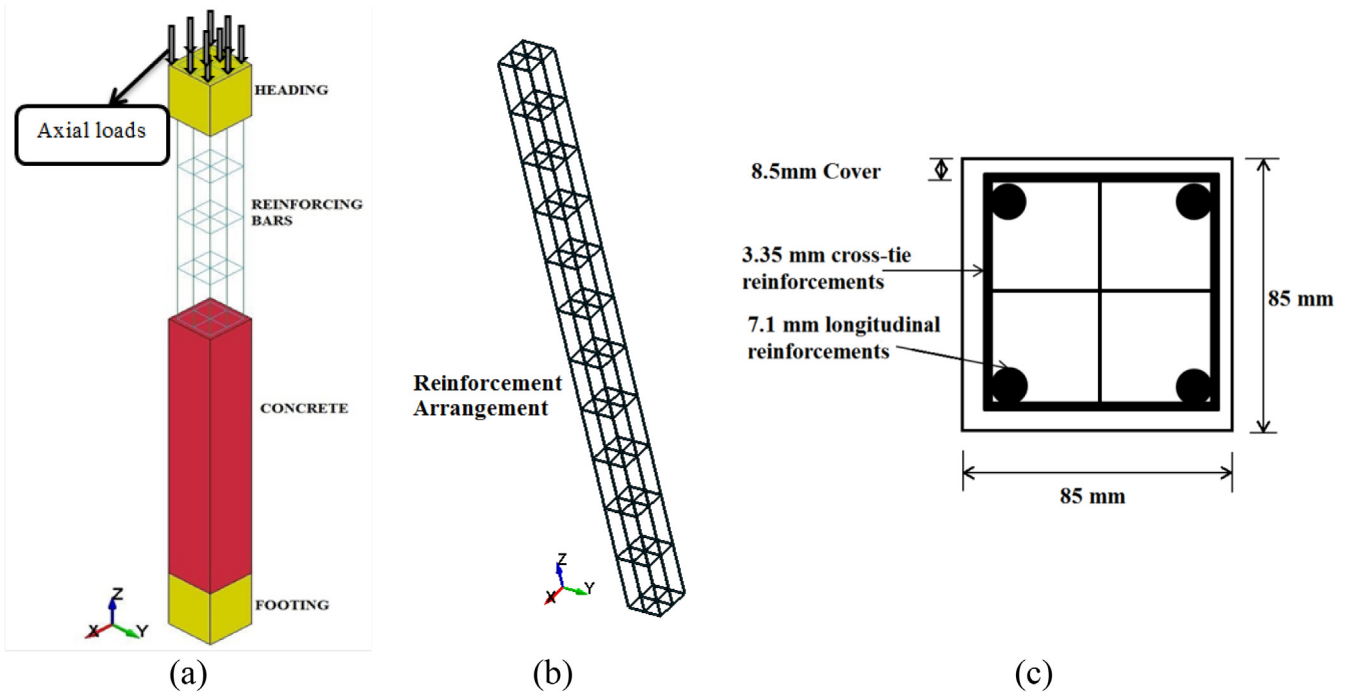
(a) Details of un-strengthened RC column, (b) Reinforcement arrangement and (c) Cross section of RC column.
